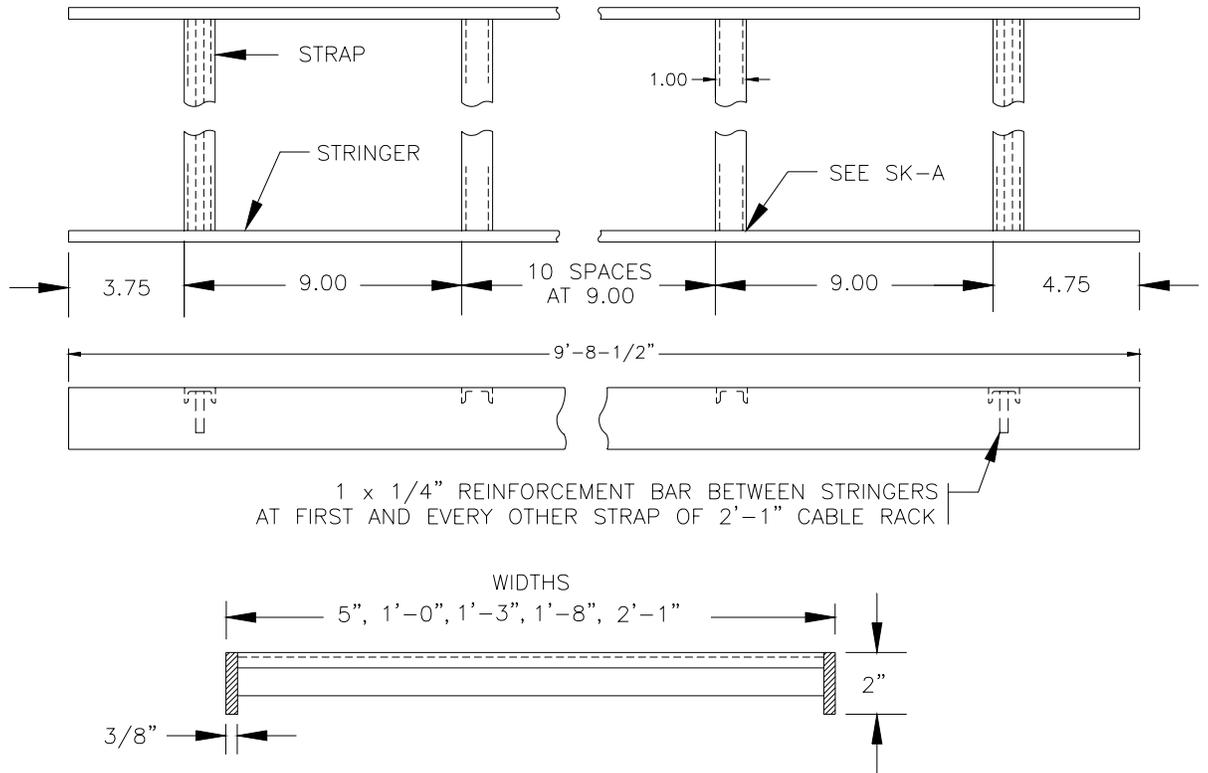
Typical Cross Sectional Cable Rack Designation Scheme
